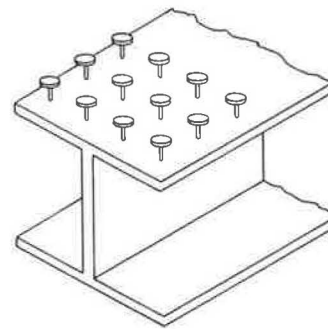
Array of steel studs welded to girder flange (10).
